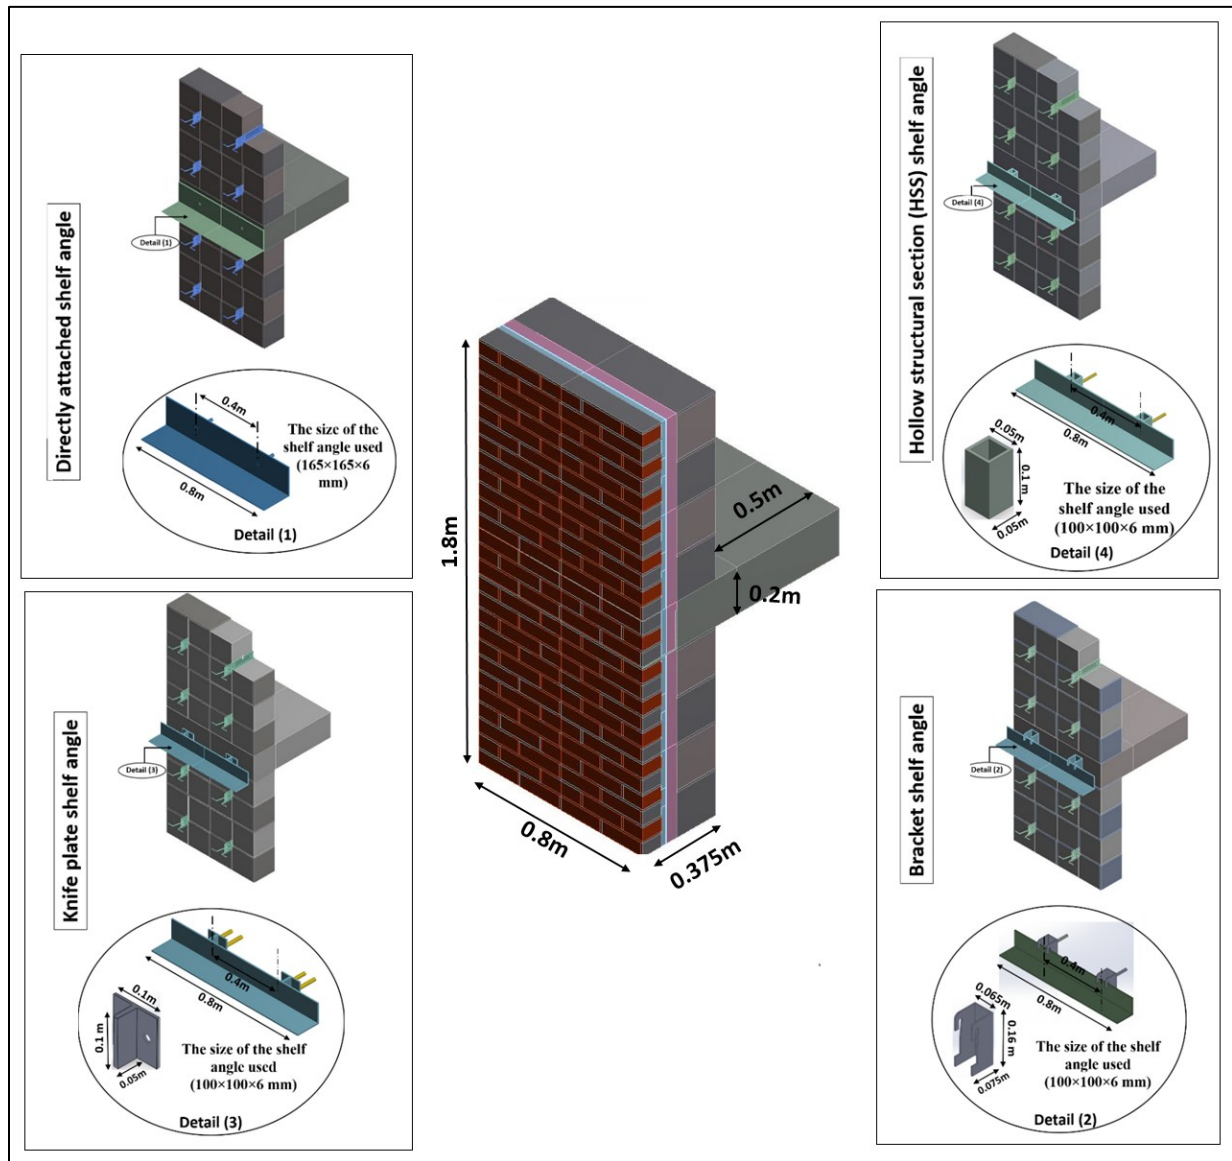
Type and dimensions of the 3D studied intermediate floor intersections finite element assemblies
